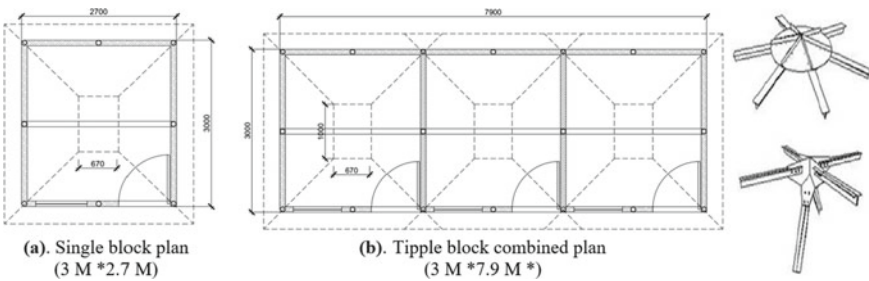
AutoCAD 2-dimensional plan of prefab and modular house and roof connector
